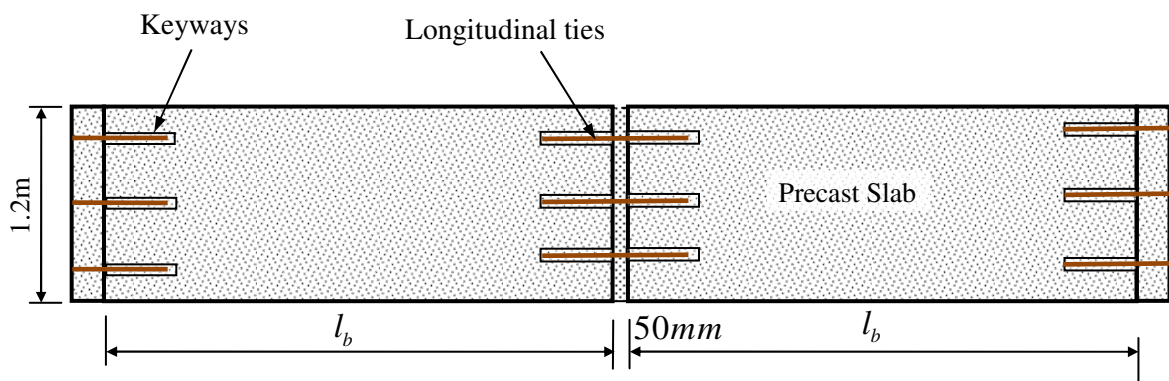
Floor-to-floor system facilitated by longitudinal ties.
